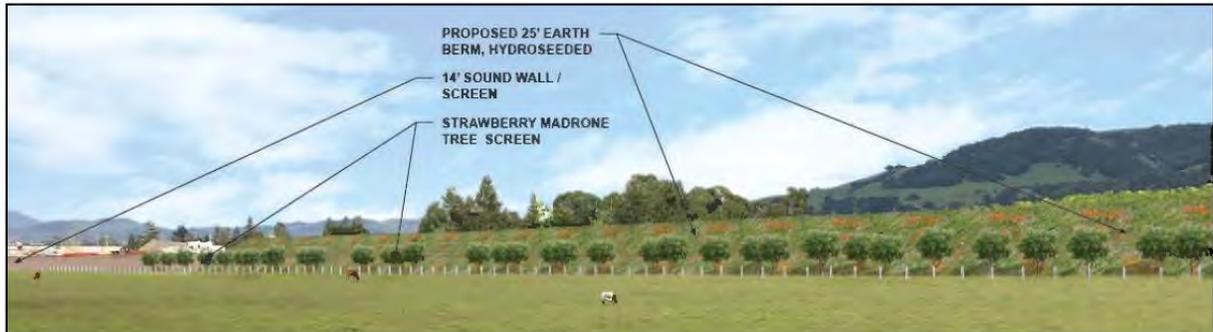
Visual Simulation of Proposed Berm and Soil Stockpile, from Figure 4 Proposed Berm, Sound Wall, and Tree Plantings (Source: Carlile Macy, March 26, 2018)
